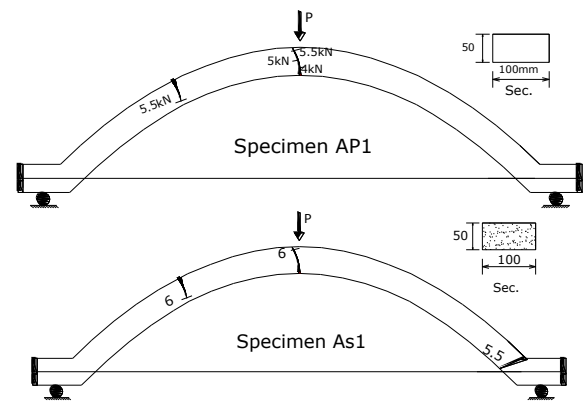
cracking behavior of un-reinforced concrete AP1 and AP2
